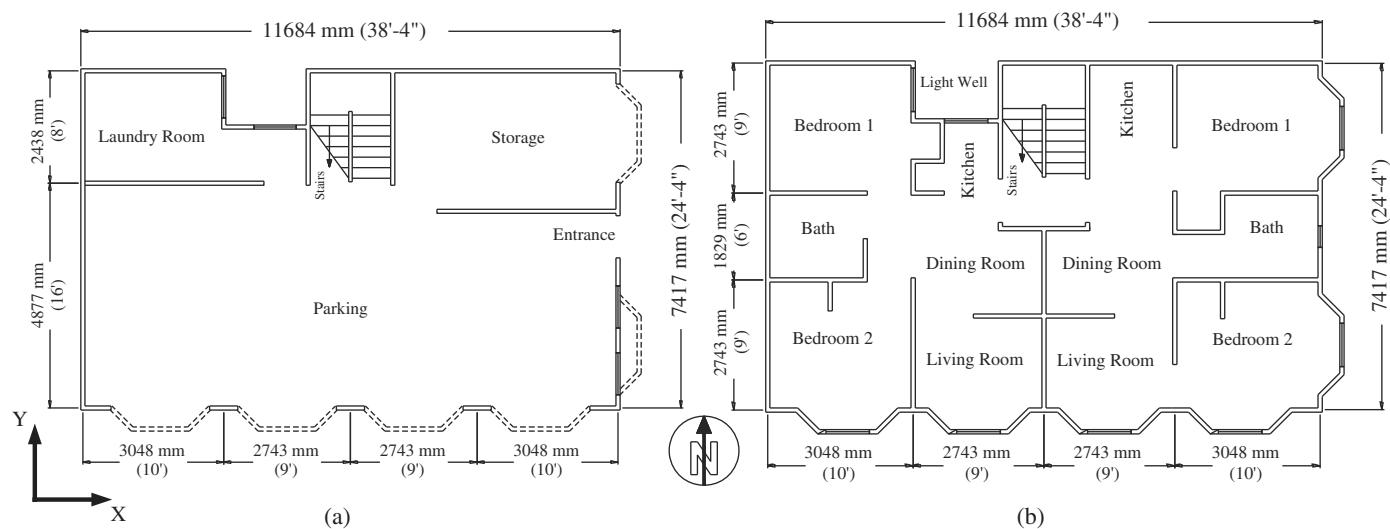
Floor plans for the four-story test building: (a) first story; (b) upper stories
